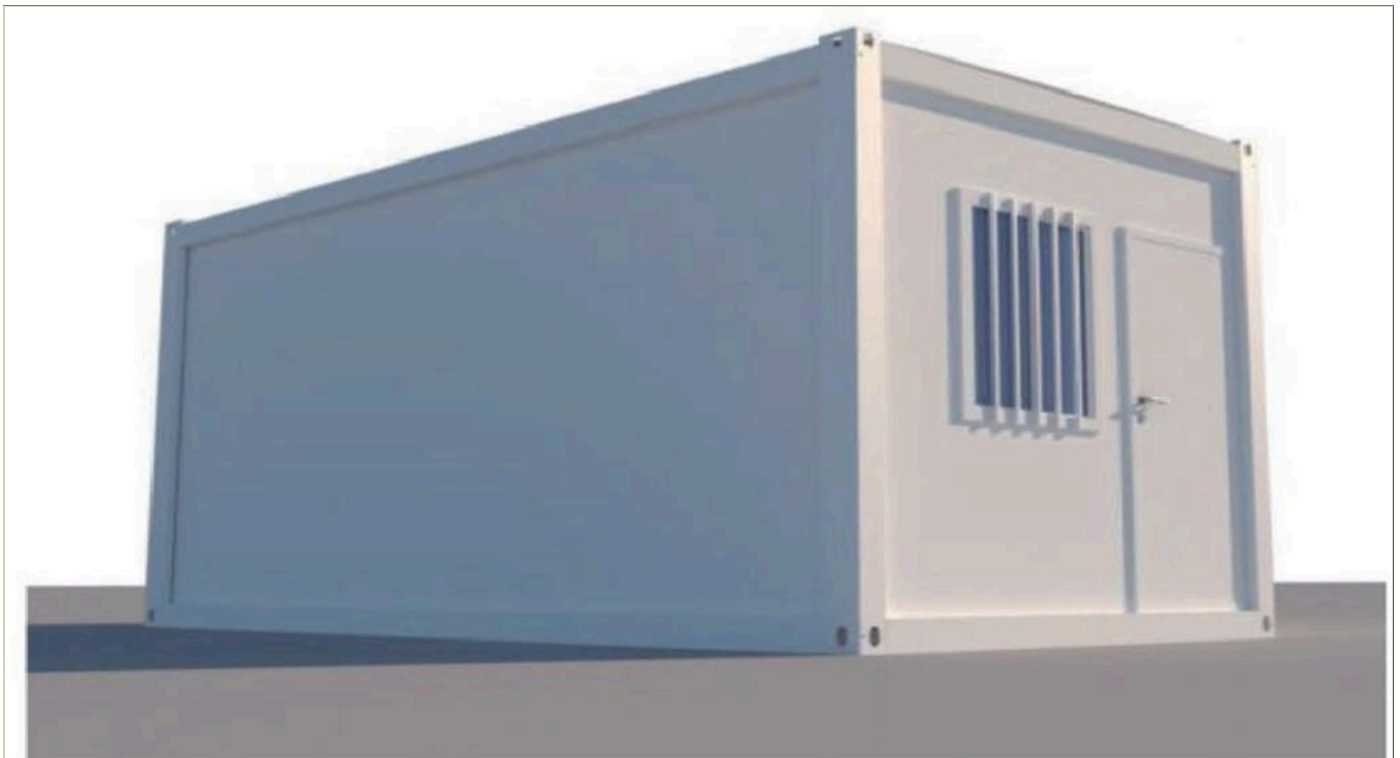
Finished exterior render — door and window installed on the 3 m wall.
